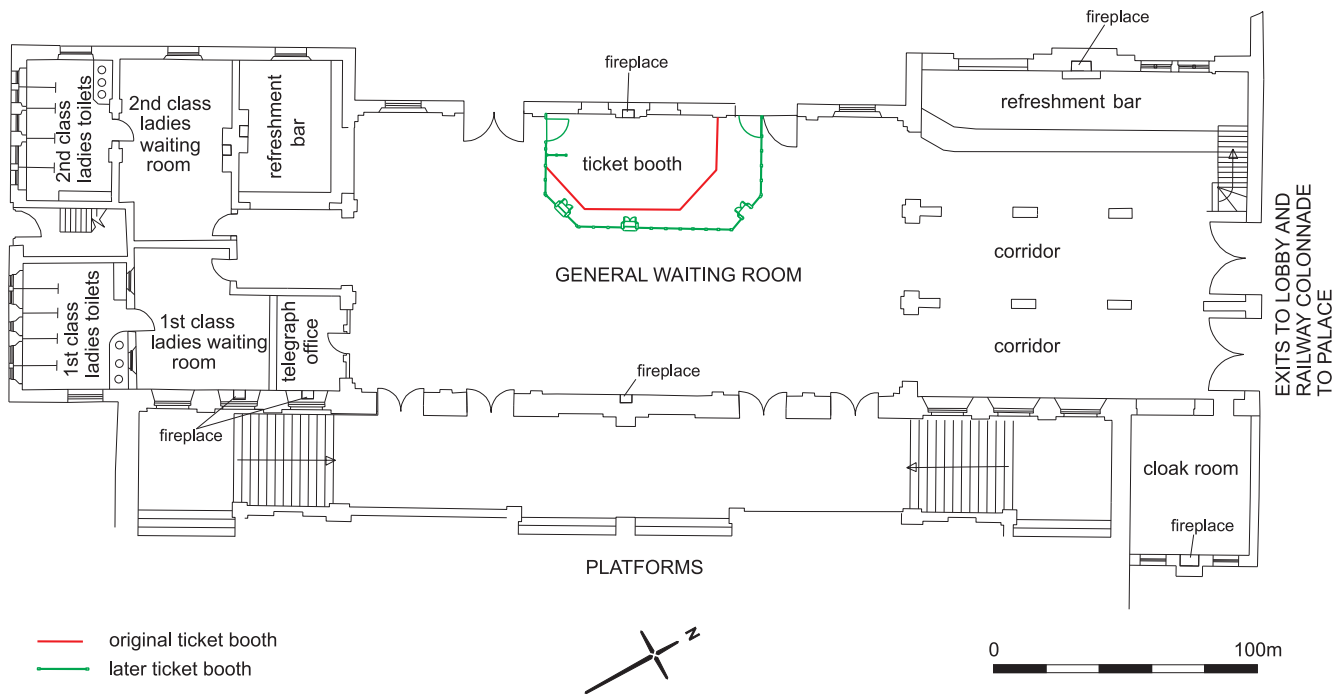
the internal layout of the station entrance building, according to the 1875 architectural plans
